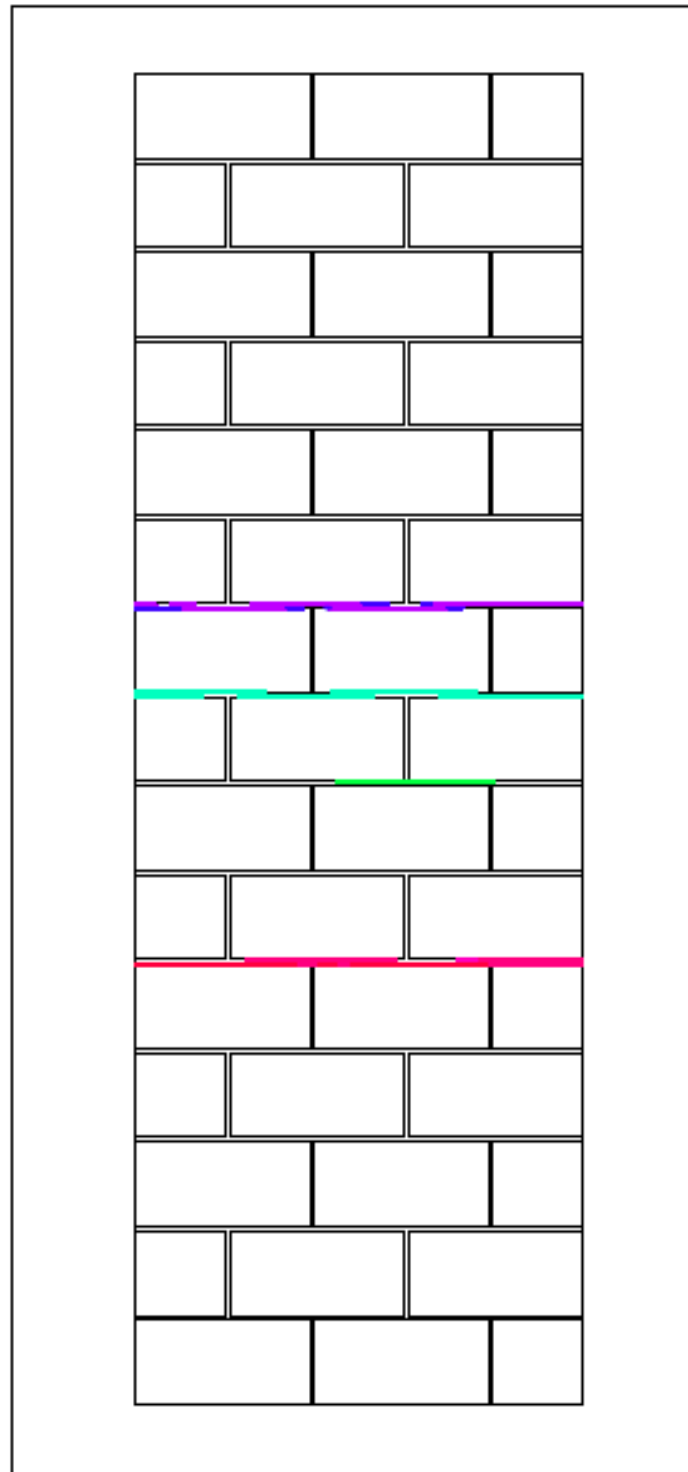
Cracking Pattern of B-2 3m Wall
